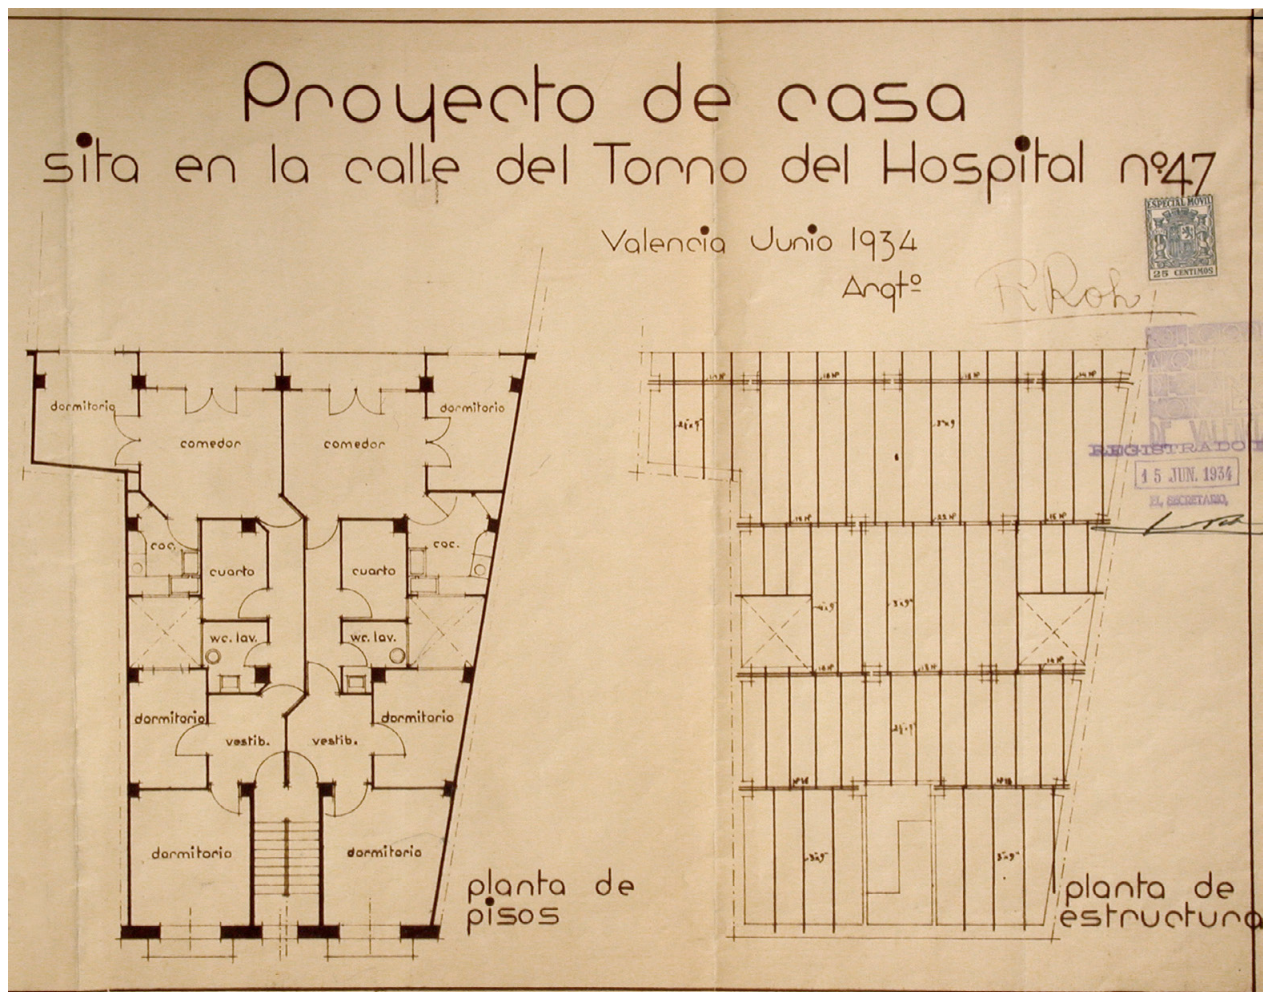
Vicente Roso building, 1934. Floor plan of the distribution and structure floor plan Source: AHMV.
